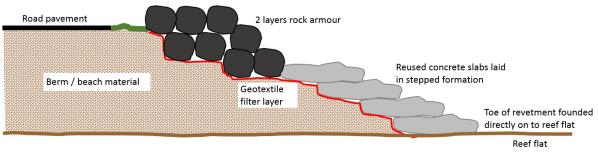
Cross-section of the proposed reconstructed revetment at Mosral
